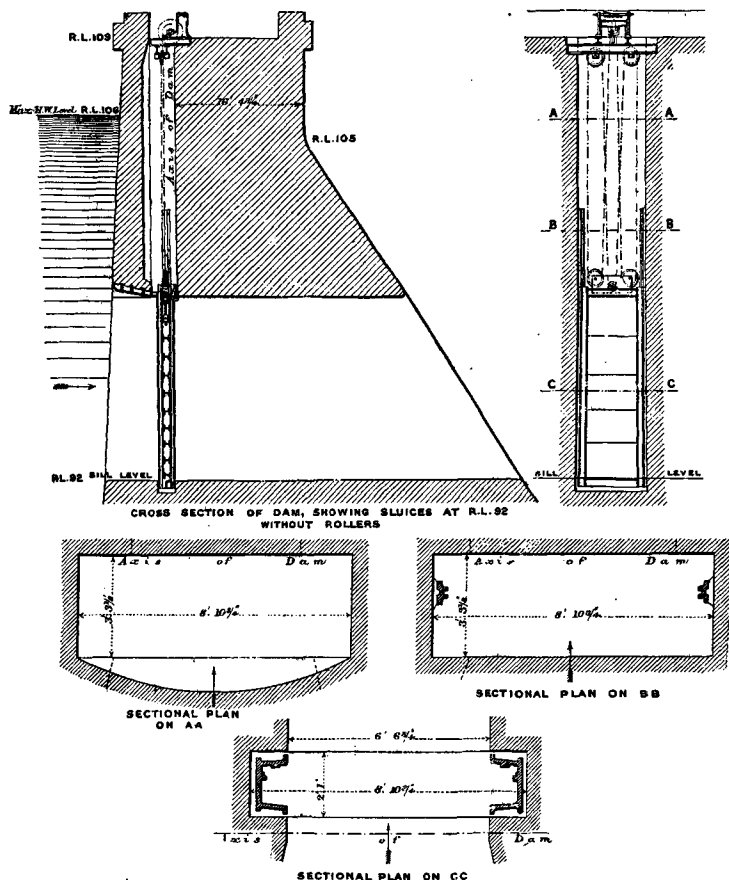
Assuan Dam. Sluices at R.L. 92'00.
